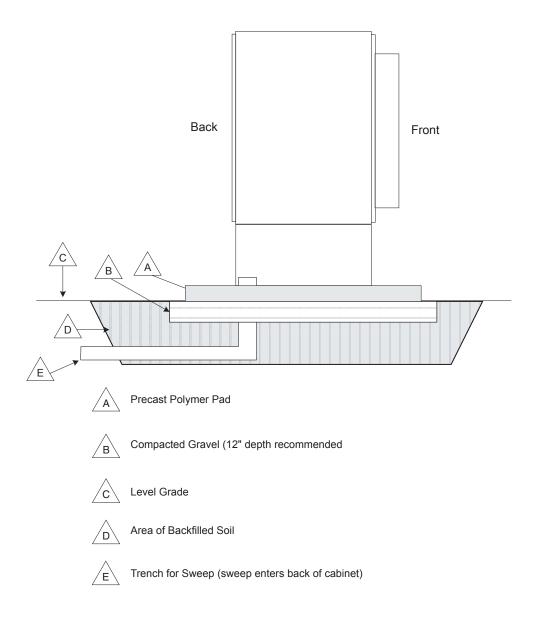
, Typical Site Arrangement, (stand-alone cabinet)
